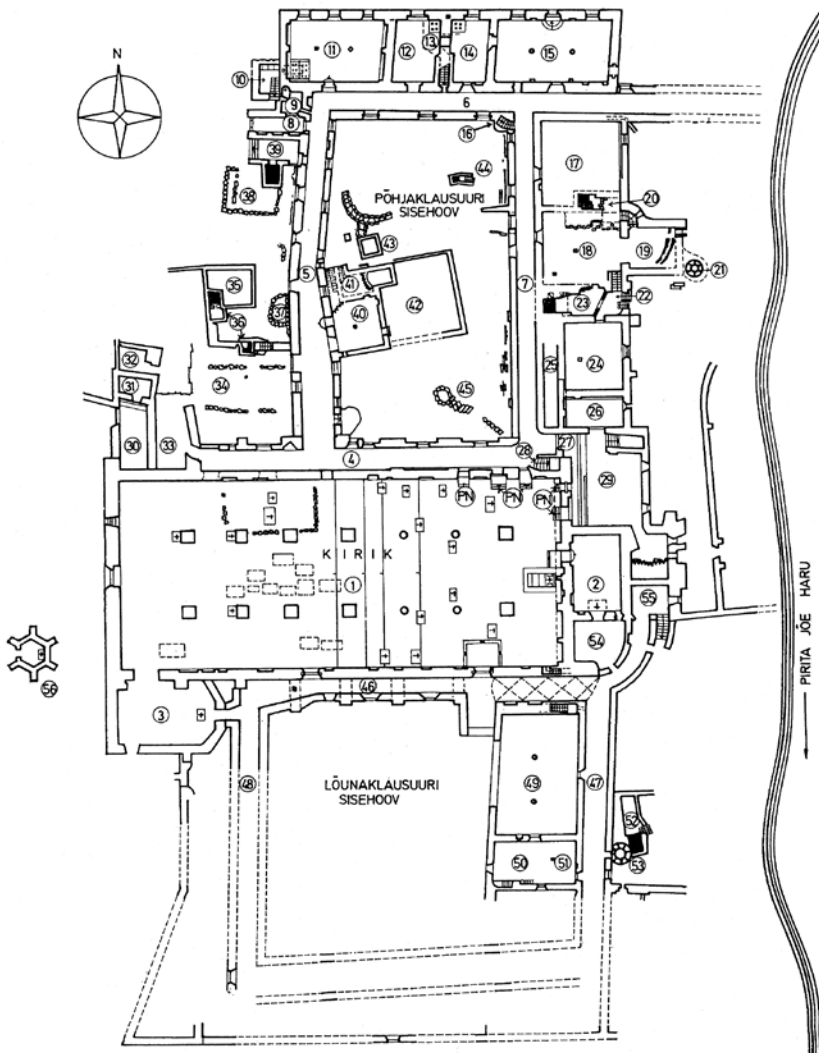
Ground plan of the Pirita convent. Plan by Tõnu Parmakson.
